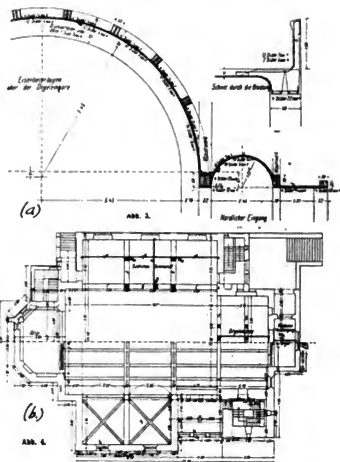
STRUCTURAL DETAILS AND GENERAL PLAN OF CHURCH IN BAVARIA.
